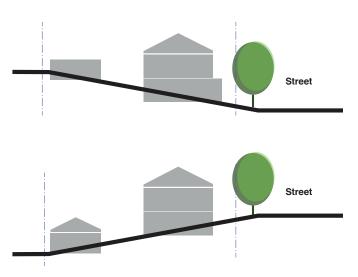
On both uphill and downhill lots, coach houses need to consider massing implications from the fronting street and the lane, and seek to minimize excavation and exposed foundation walls.
